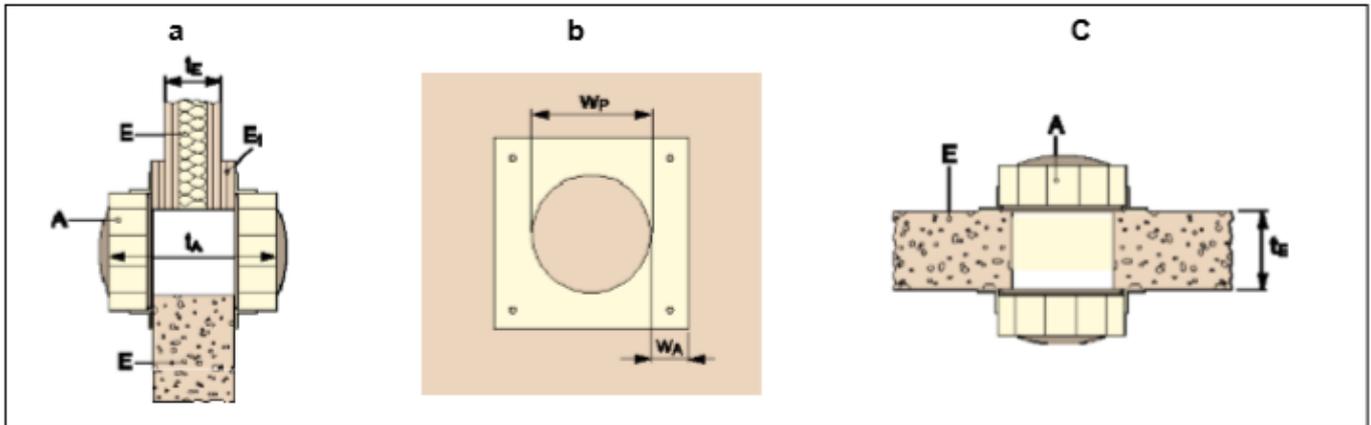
board frame (a, b) and position of the penetration seal in walls / floors (a,c)
